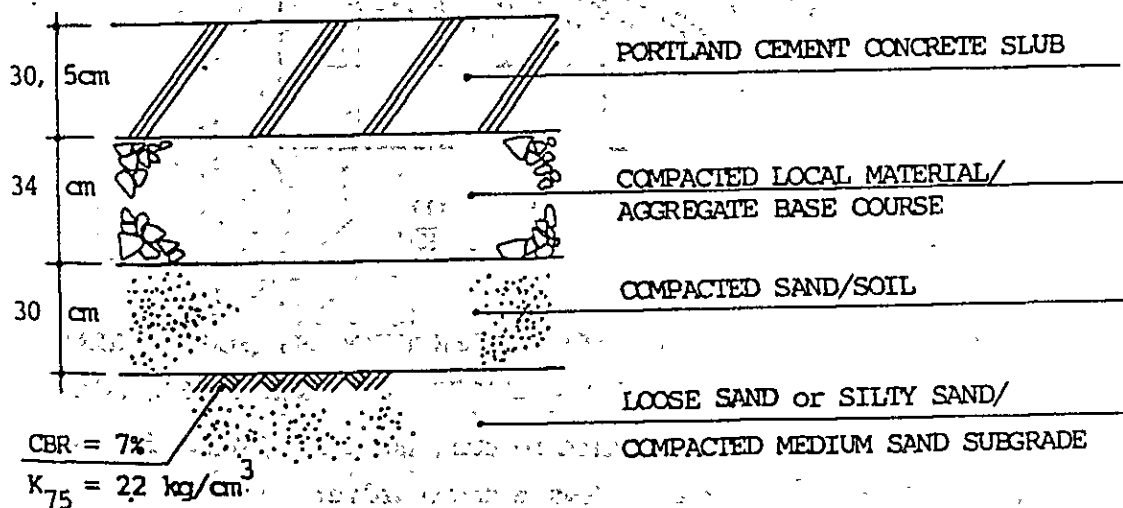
EXISTING RUNWAY PAVEMENT STRUCTURE
